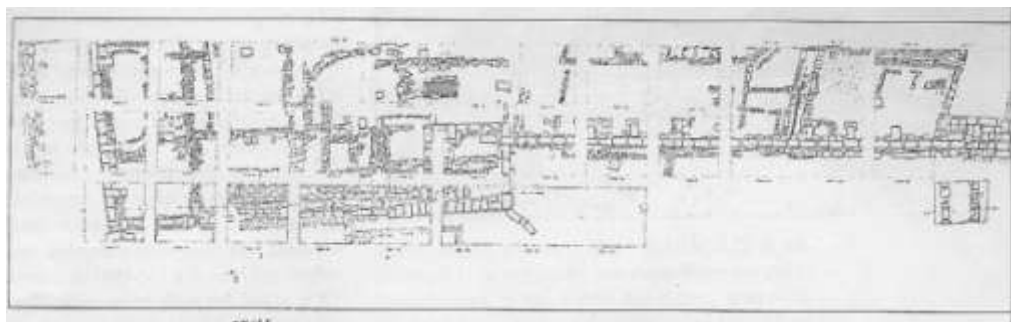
Site plan of the north wall of Alope (Bouyia 2000a, plan 1)
